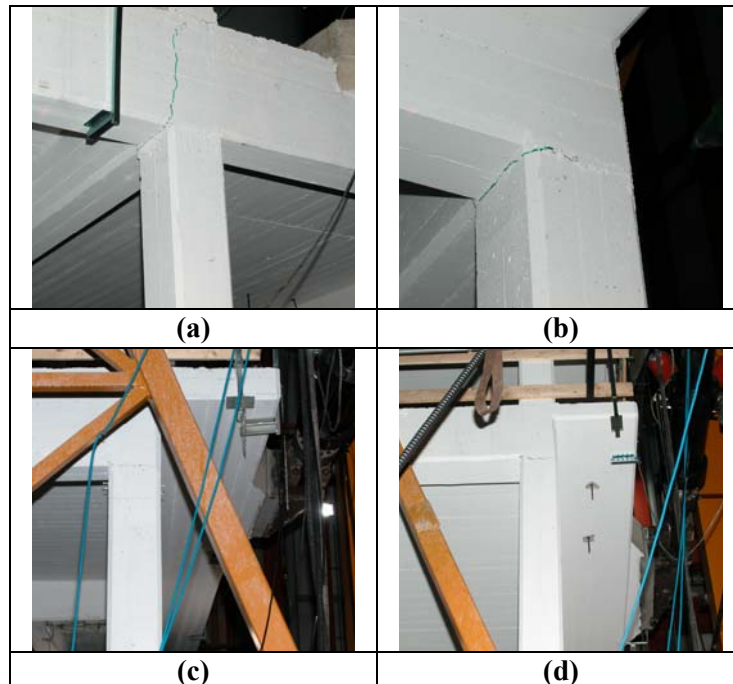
Cracks on columns C1 (a) and C2 (b) at 1st floor, C7 at 1st floor (c) and 2nd floor (d).
